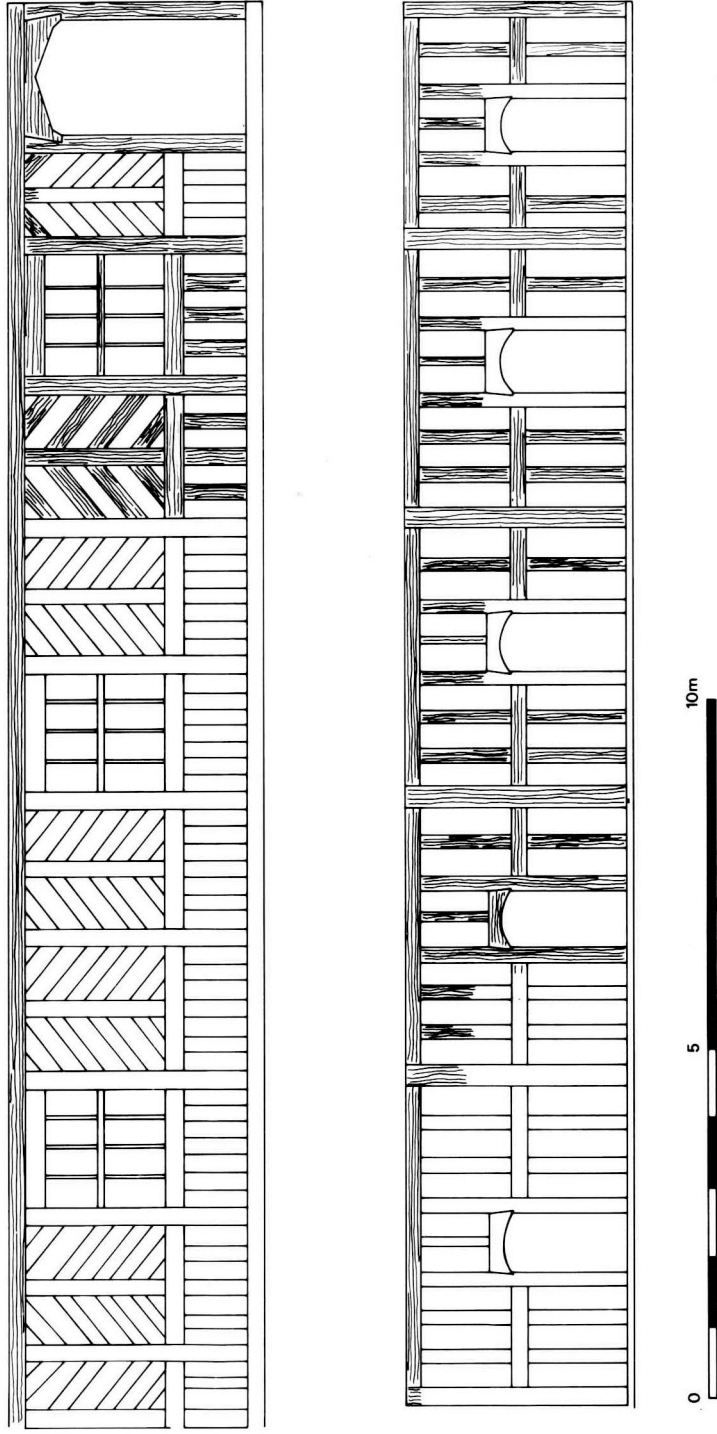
Elevation of upper storey of north wall of refectory range and corridor wall behind.
